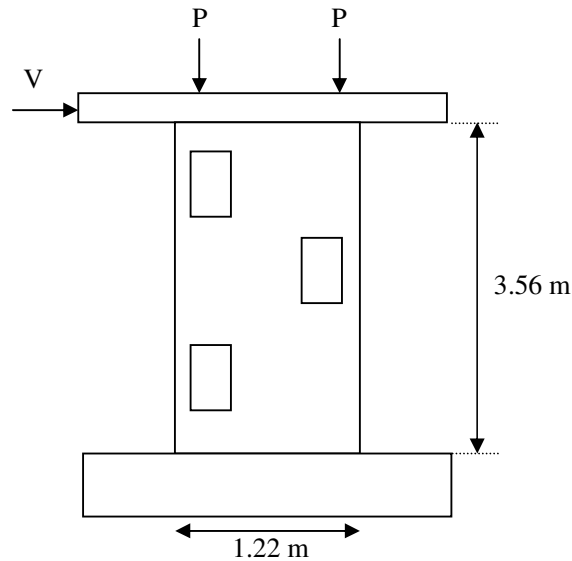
Shear wall with staggered opening (Ali and Wight, 1991)
